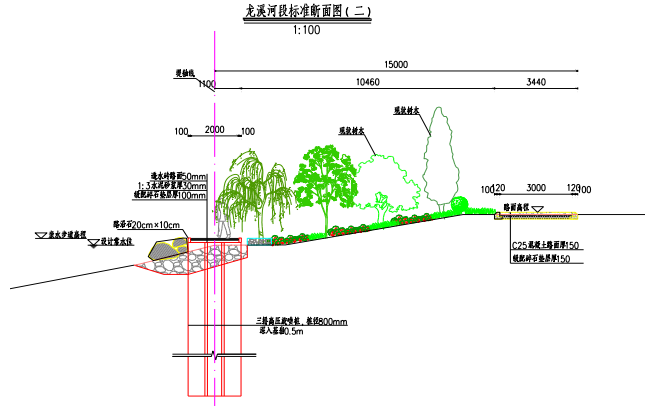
Proposed Cross Section of Longxi River (Dandu Tang, Changshou)
